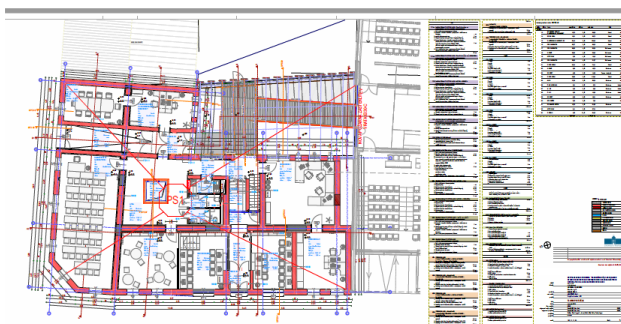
Baroness' Hause new design plan to first floor (by Styria Architecture d.o.o.)
